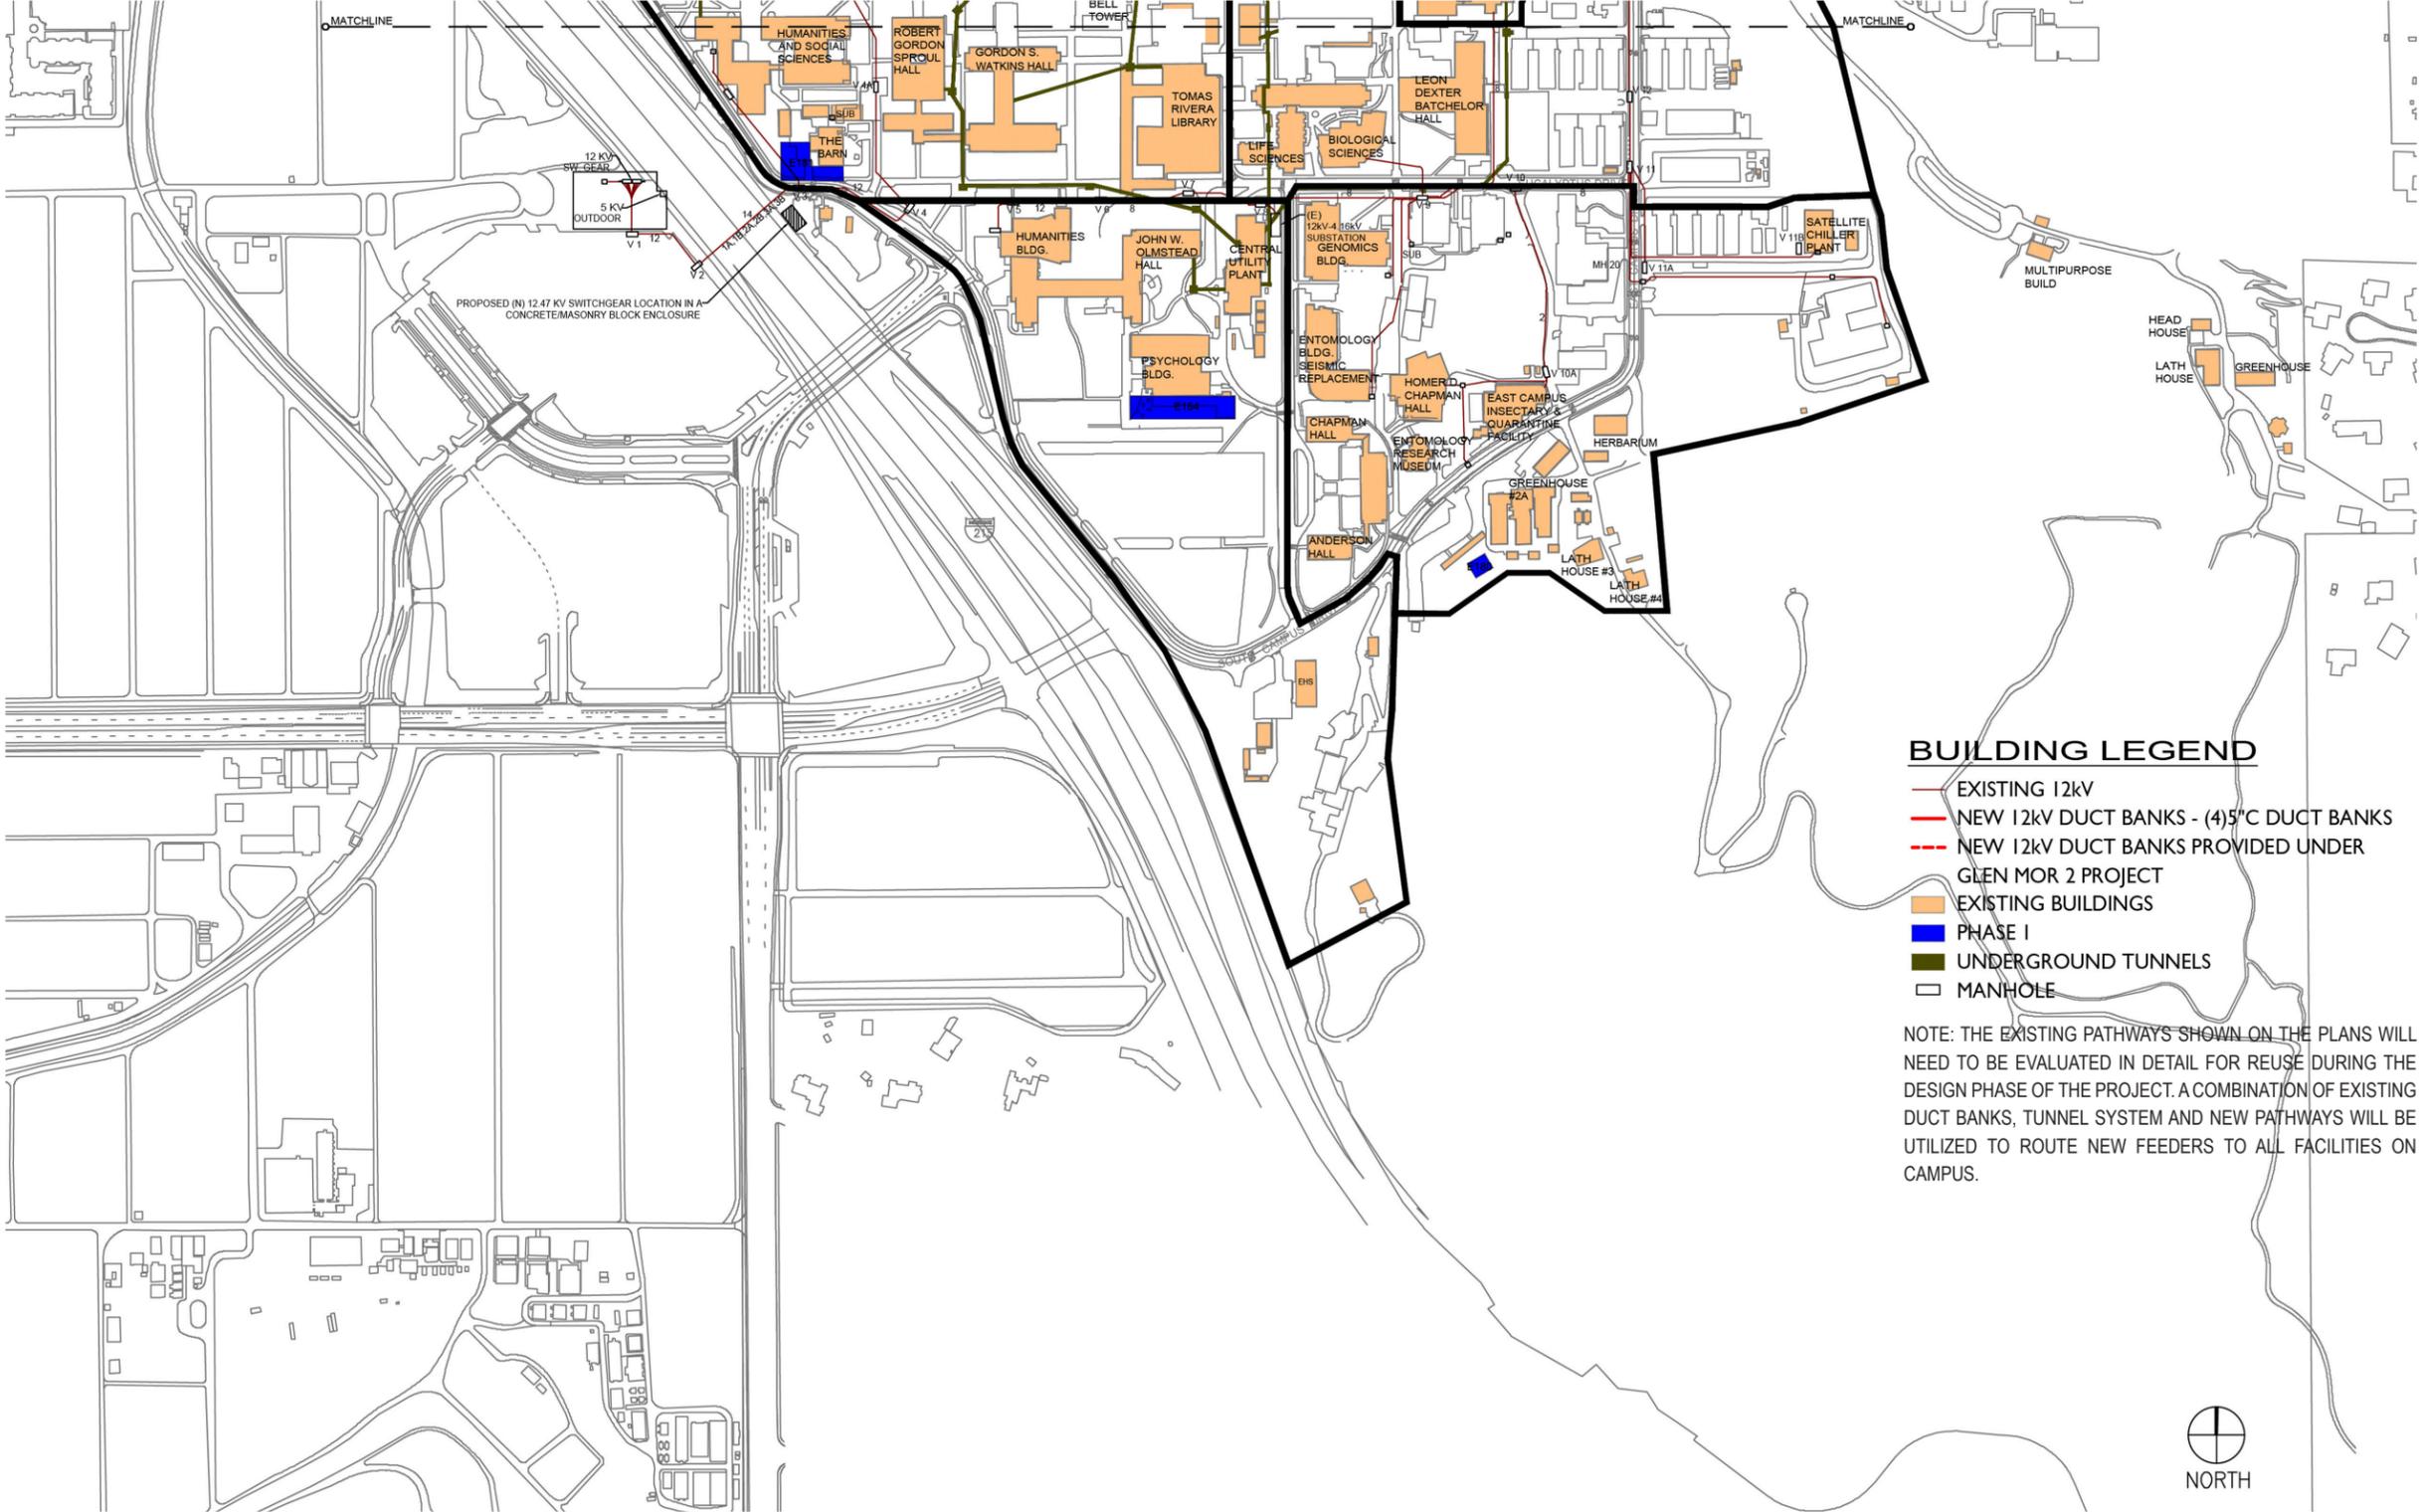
Phase 1 Buildings Electrical Site Plan–South
